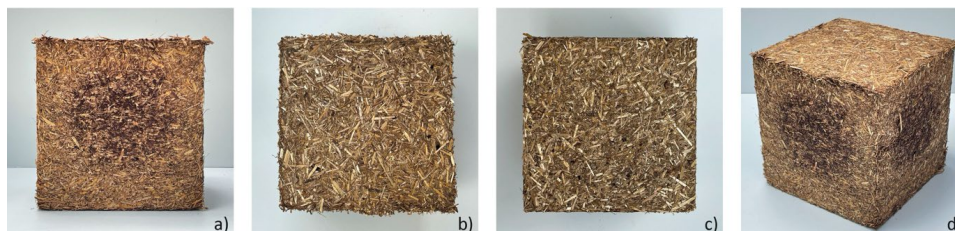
Exemplary finished test specimen; a) front, b) top, c) bottom, d) side
